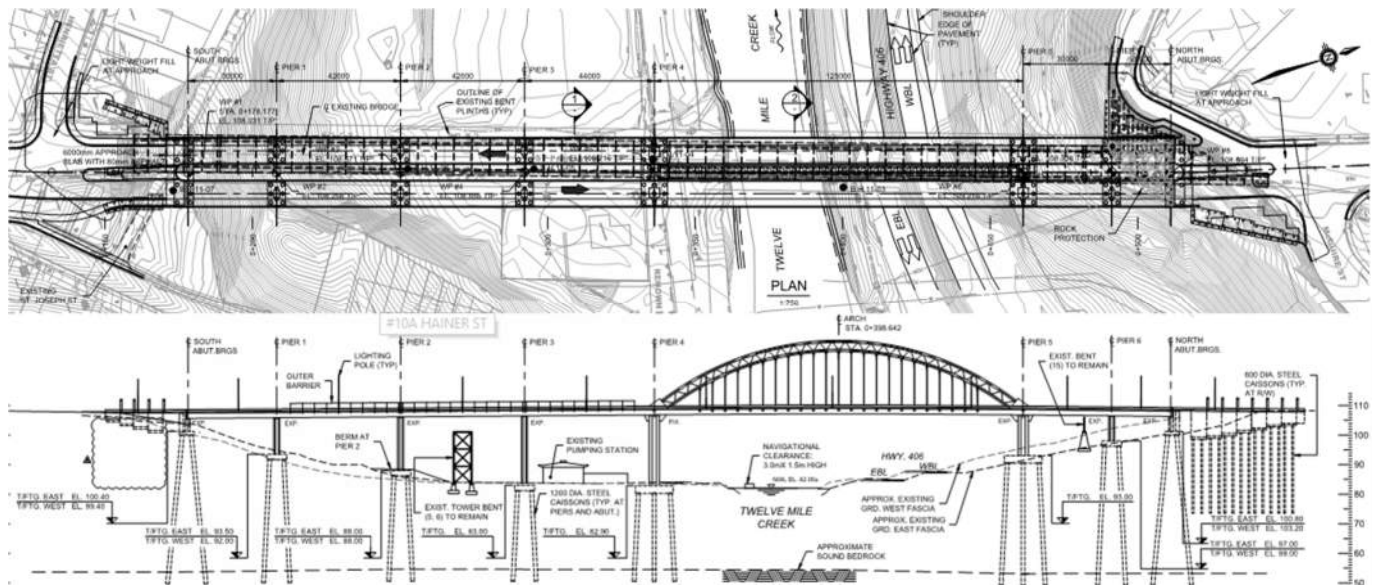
Burgoyne Bridge Plan and Elevation
